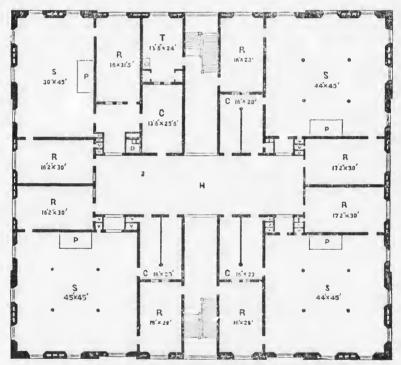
Plan of the First Floor or Second Storey, adapted to Fig. 197.
